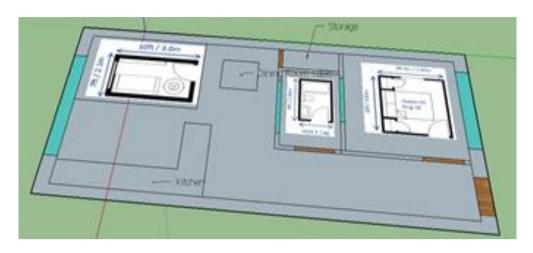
Fourth Iteration Floor Plan [3 one-bedroom apartments +shared basement]
